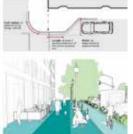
Street sections board for the public open house showing examples of street sections, pedestrian crossings, and walkways.
